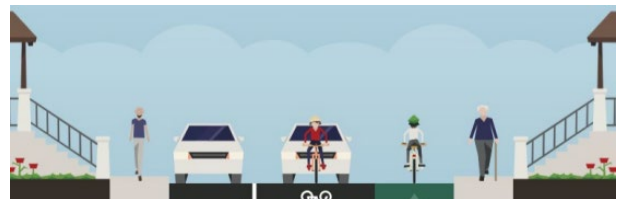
Illustration showing the proposed changes on Wallace Avenue between Lansdowne Avenue and St. Clarens Avenue, facing west.
